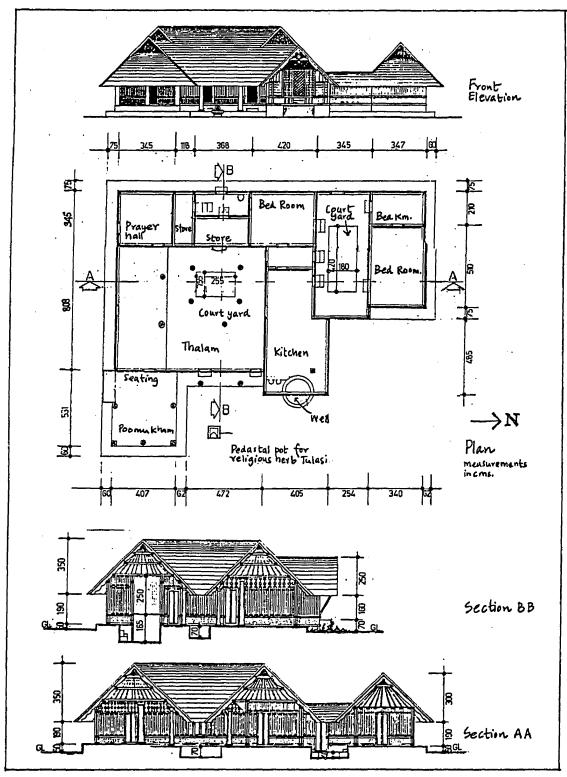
Elevation, plan and sections of sample H6 (After: Department of Architecture, COE Thiruvananthapuram, Documentation of Sreekariyathumadom, 1993).
